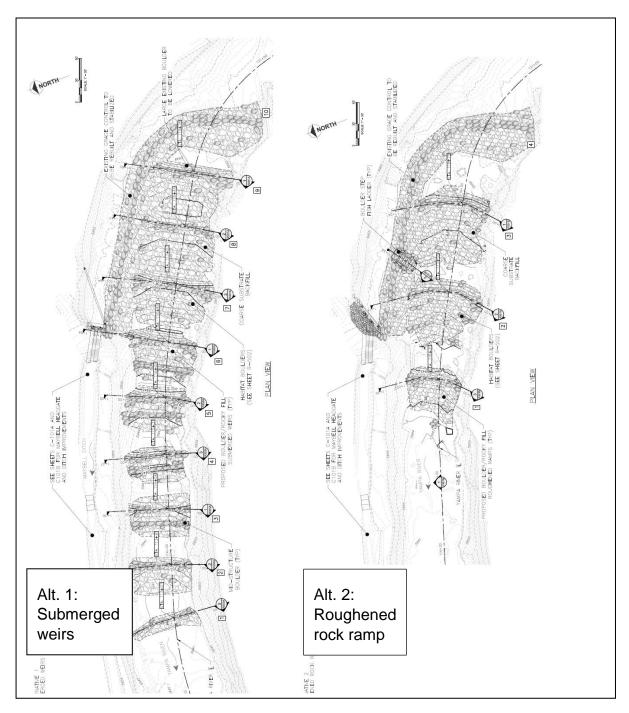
Plan-view comparison of Alternative 1 (submerged weirs) and Alternative 2 (roughened rock ramp) from 30% design for in-stream improvements to the Maybell diversion. (Source: J-U-B).
